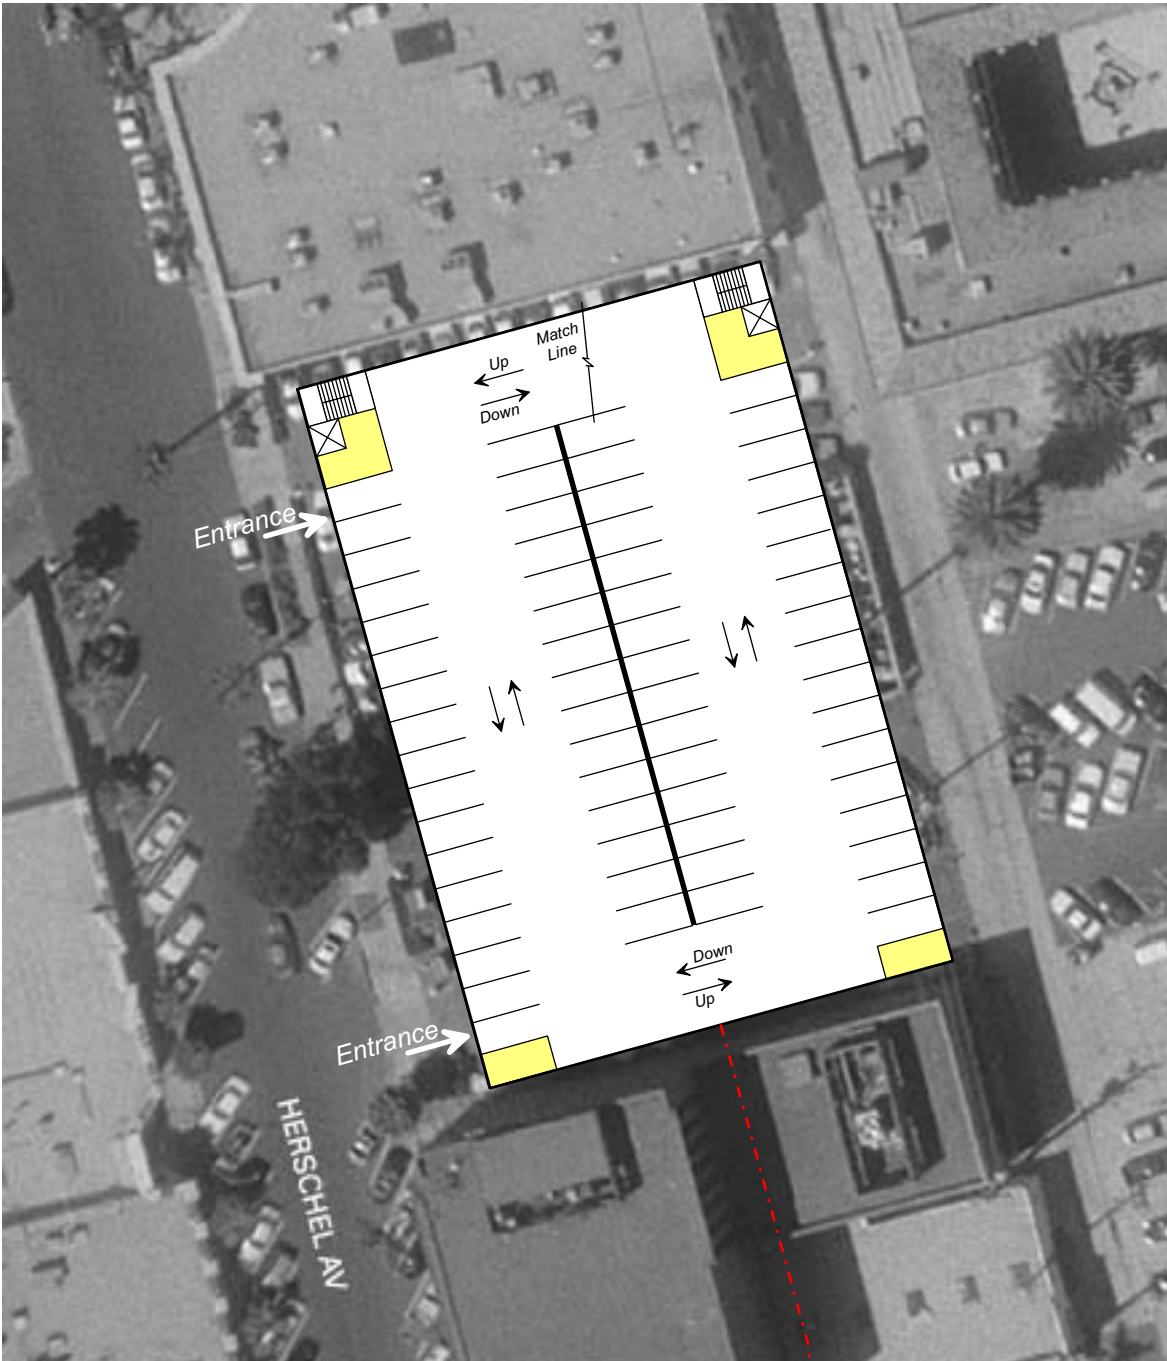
shows the concept including a typical floor plan and elevation. The concept includes ramps at each end to provide circulation to each half floor. The total structure is five levels (including rooftop parking), two underground and three above ground or at surface level. Traffic flow would be two-way providing reasonably easy to understand traffic circulation. Entrance and Exit would be off of Herschel Avenue via two access points.
